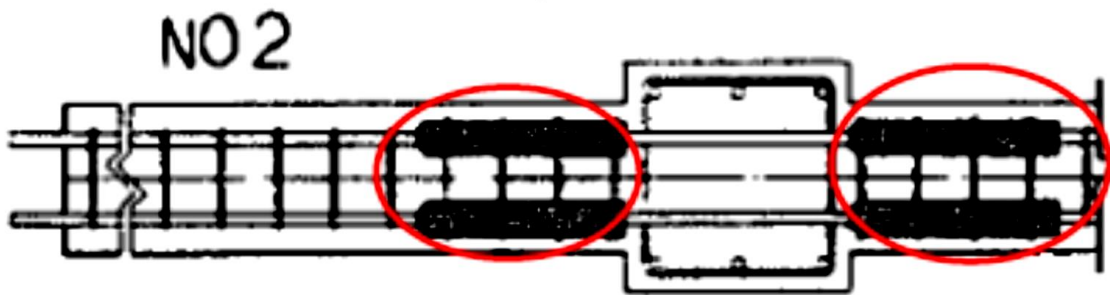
Beam with Grouted Couplers Tested by Matsuzaki et al. (1987a)
